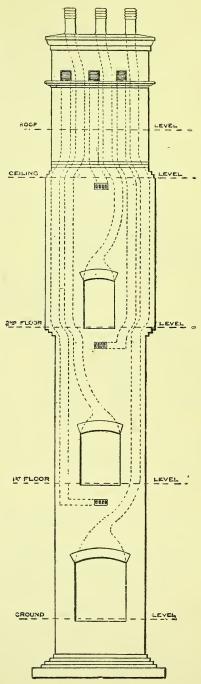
Chimney Breast, Stack and Foul-air Flue.
